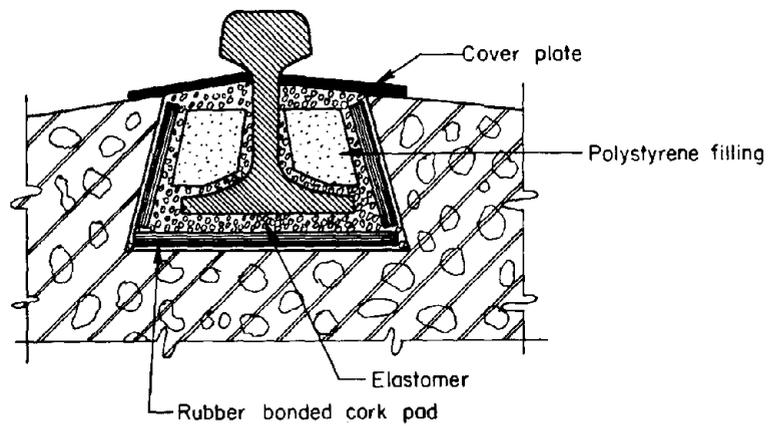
RAIL FASTENER FOR SLAB TRACK AT DEURNE
